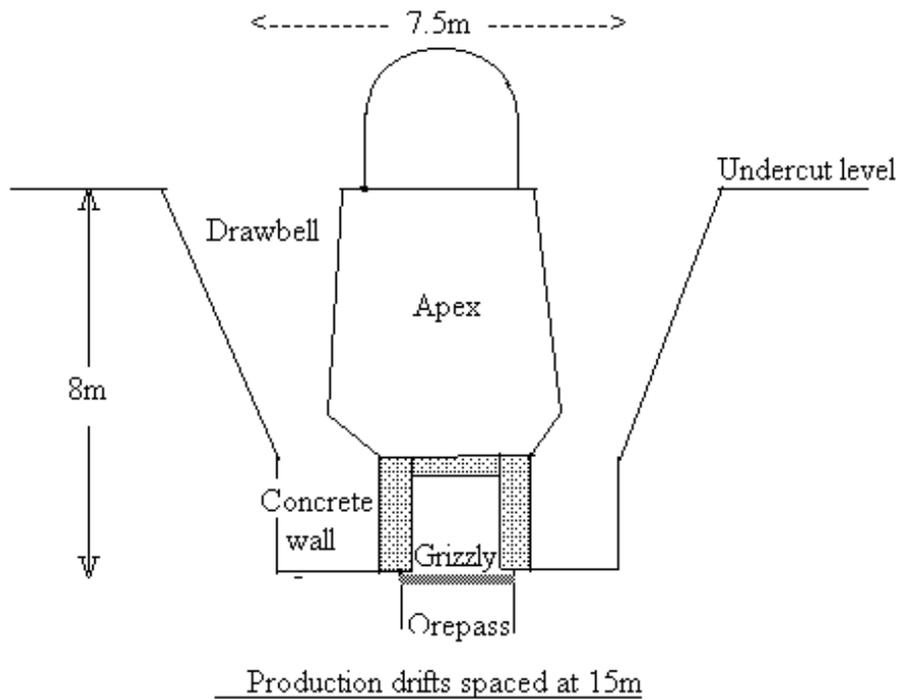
CAVING STEPS AND DESIGN DIMENSIONS OF THE GRIZZLY METHOD
